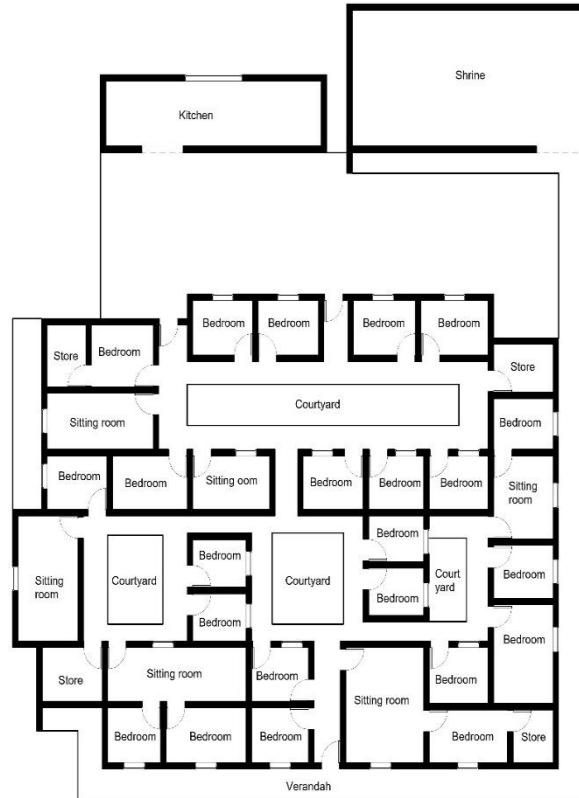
Floor Plan of A Typical Traditional Benin Palace Compound House.
